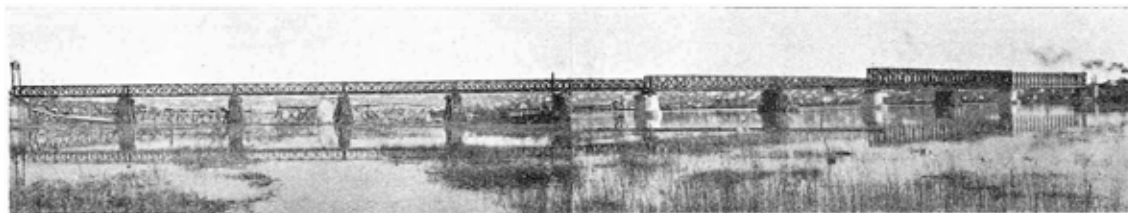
The Railway Bridge over the Sava, 1915, rebuilt with temporary Kohn and Zelisko-Roth-Waagner systems. (source: BUHLER 1930c)
